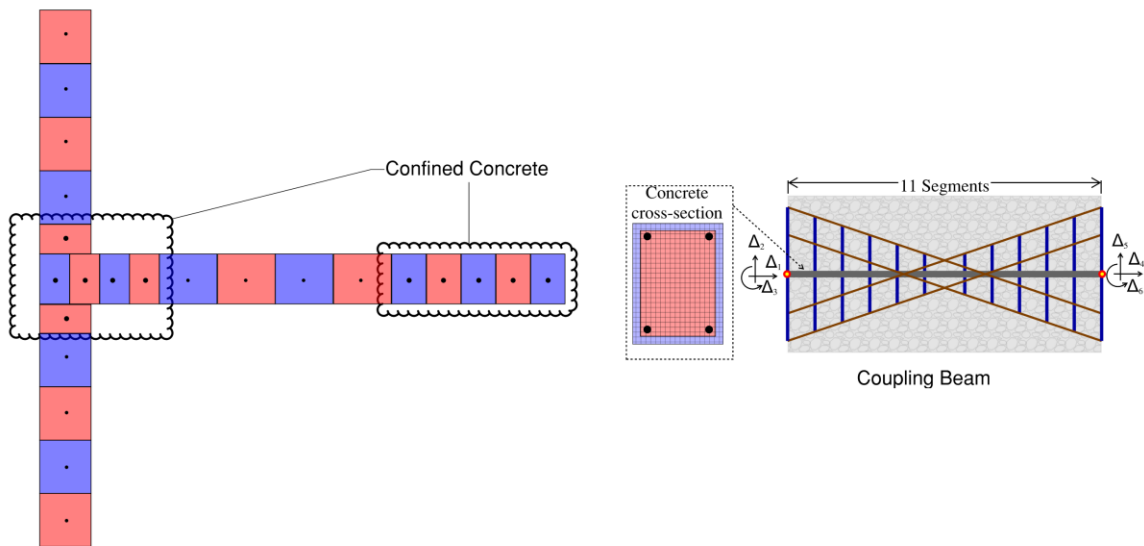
BRI-1996 wall pier cross-section and coupling beam discretization.
